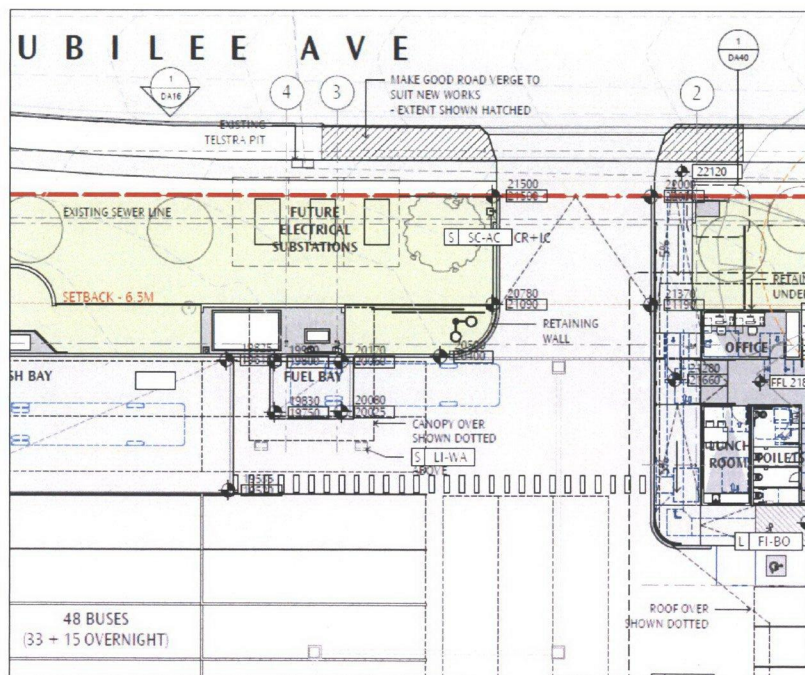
Extract from 'Drawing MasterSet' Sheet D2
